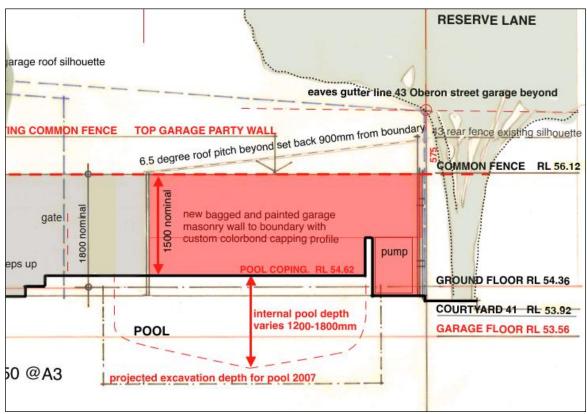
Extract of Drawing No. DA10 of the architectural plans prepared by Studio GA, as amended within this application, illustrates the eastern elevation of the proposed garage.
